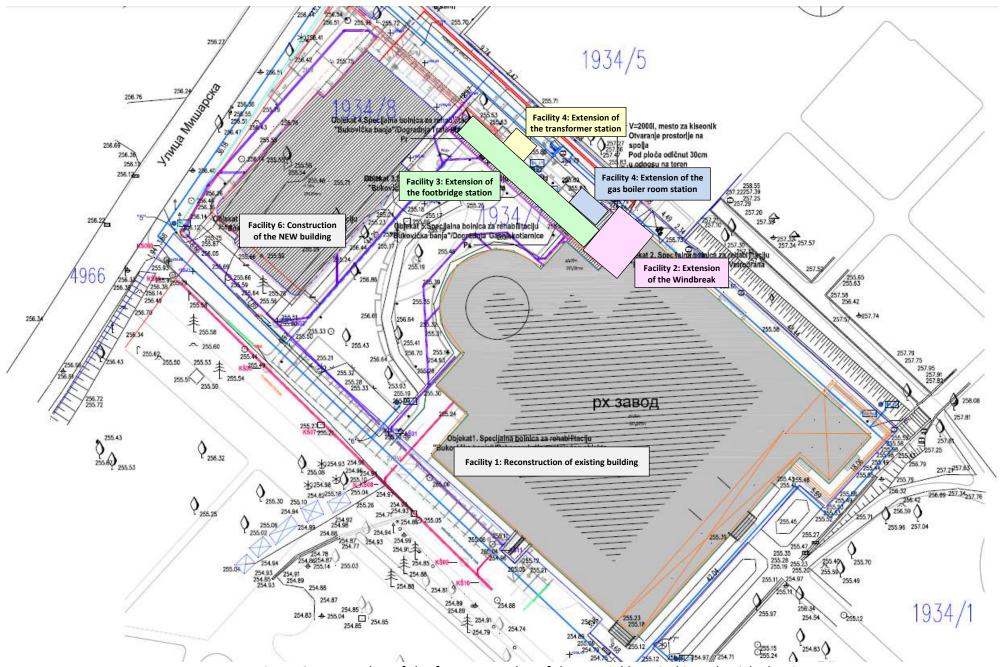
Layout plan of the future complex of the special hospital in Bukovicka banja
